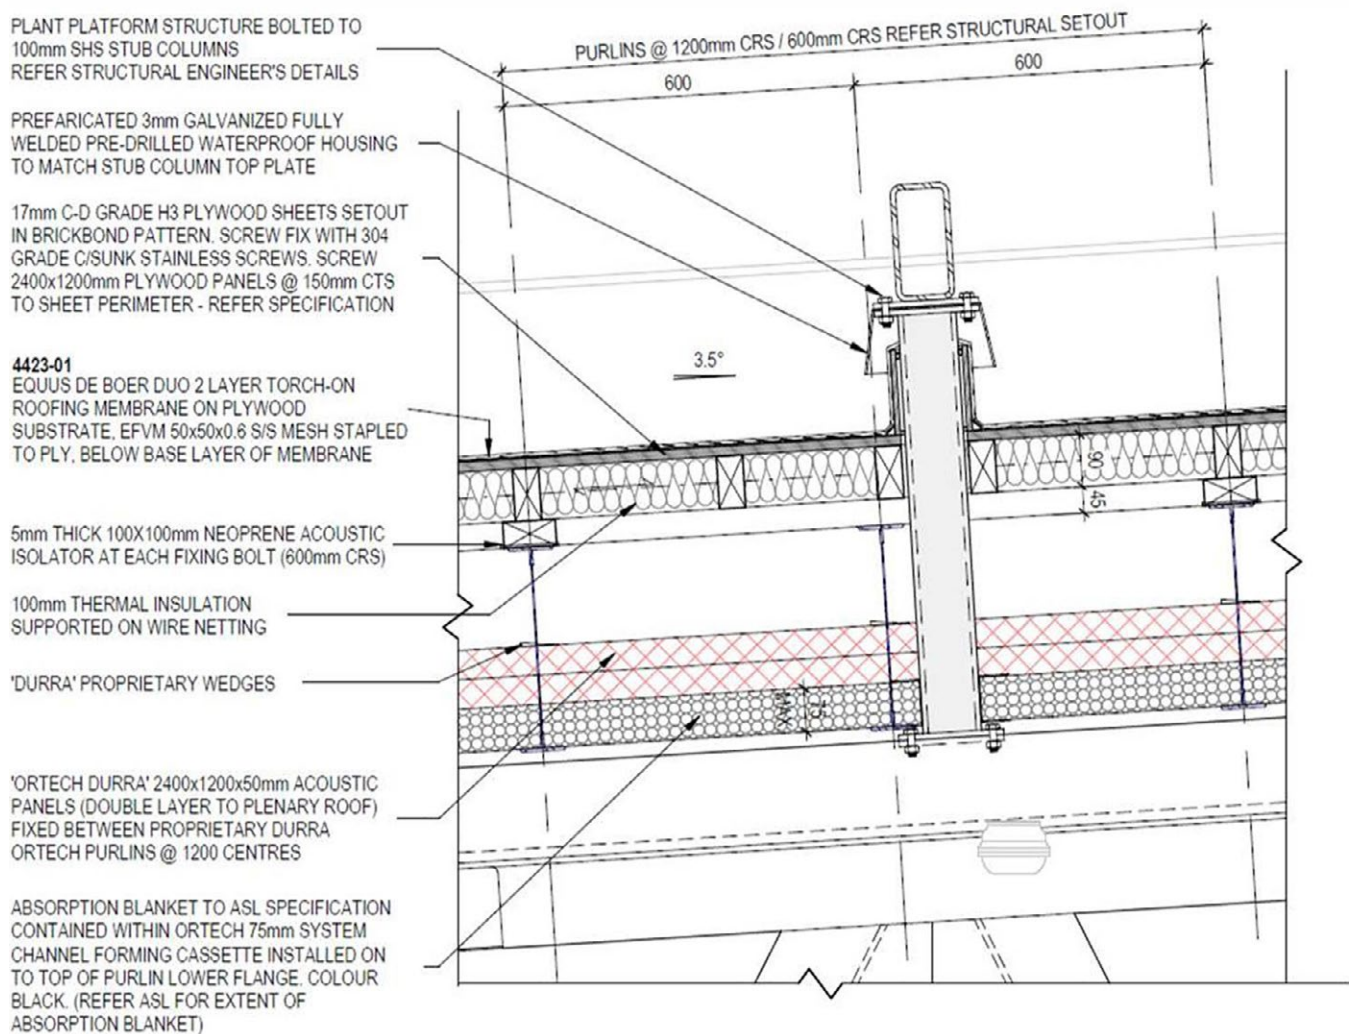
Side elevation of building materials and construction method of roof. Credit: Fletcher Construction.
